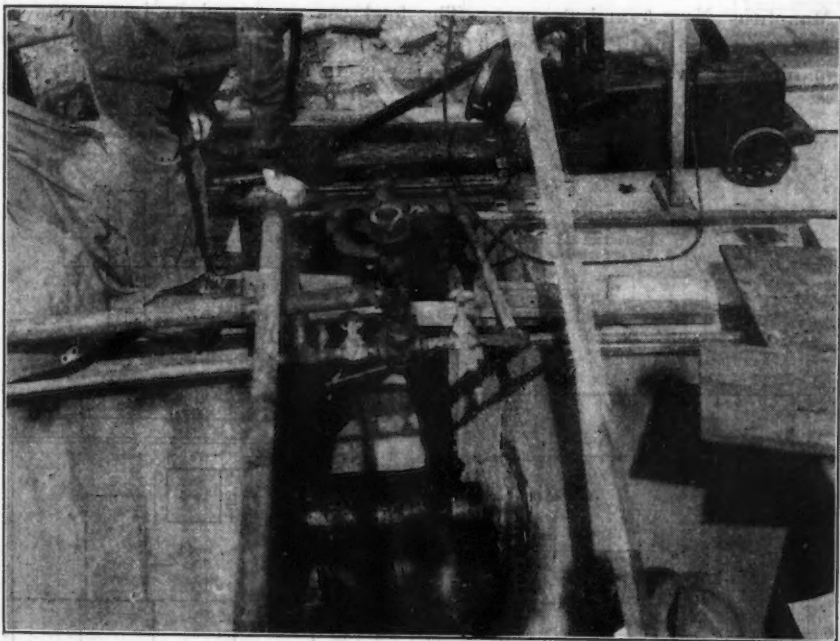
HORIZONTAL LOADING TEST BETWEEN MONOLITHS.
